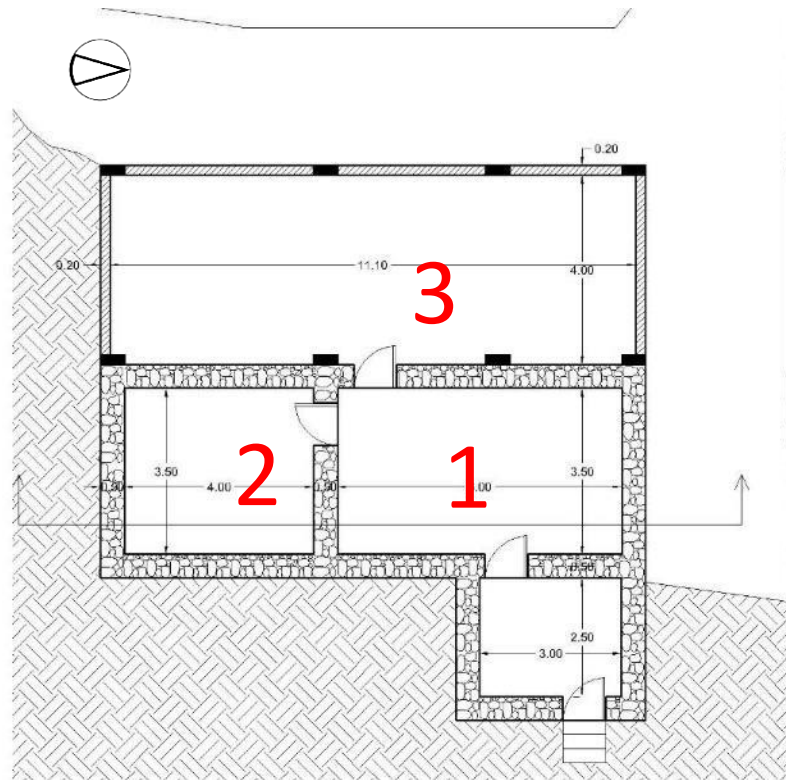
Plan of the first dwelling space constructed. The numbers in the photo resemble the space assemblage in a chronological form. The dwelling space isn't built underground, but it was built with the slope of the hill. Later on space 3 and 4 were added late 1990's. Source: Author (2019)
